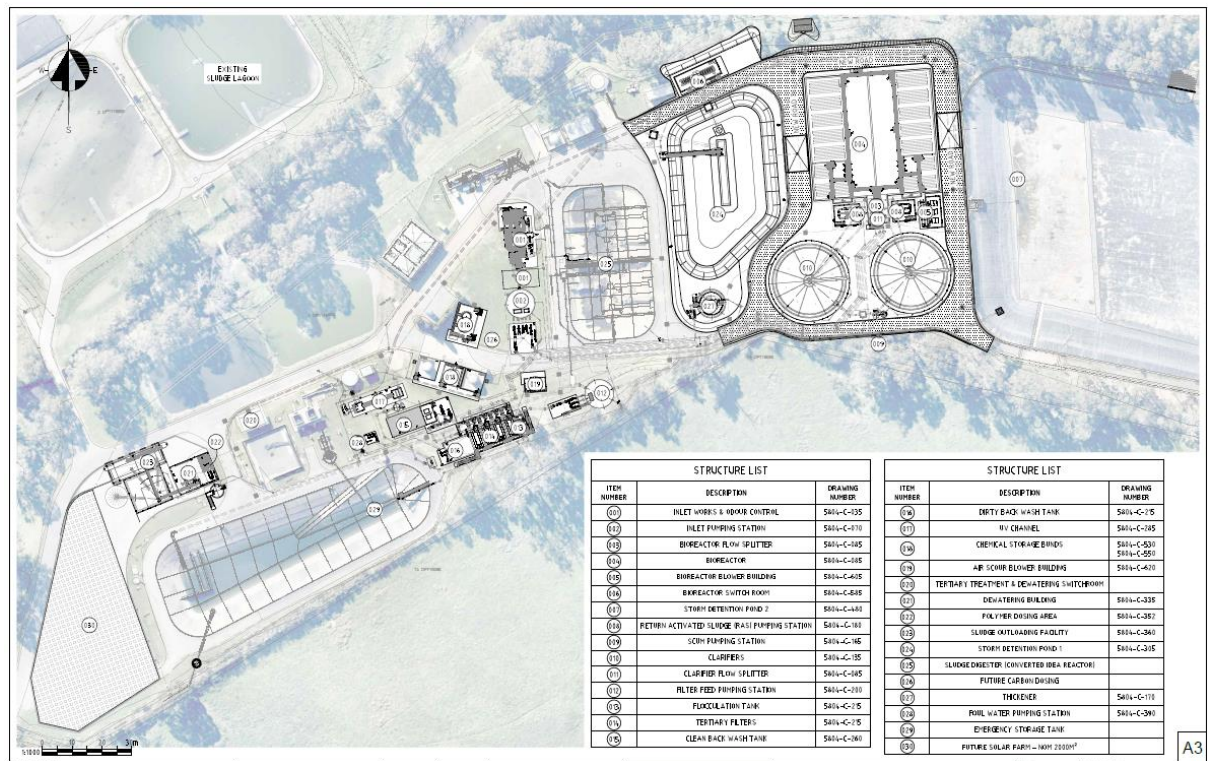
Bowral STP Upgrade – Site Arrangement Works for the Proposed Works
